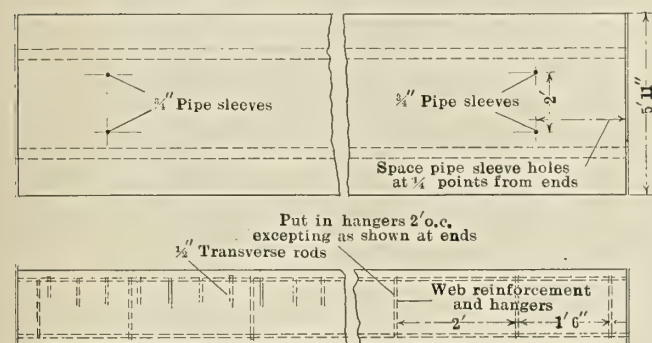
Longitudinal Section of Concrete Block. The Length Varies From 6 to 24 Feet
